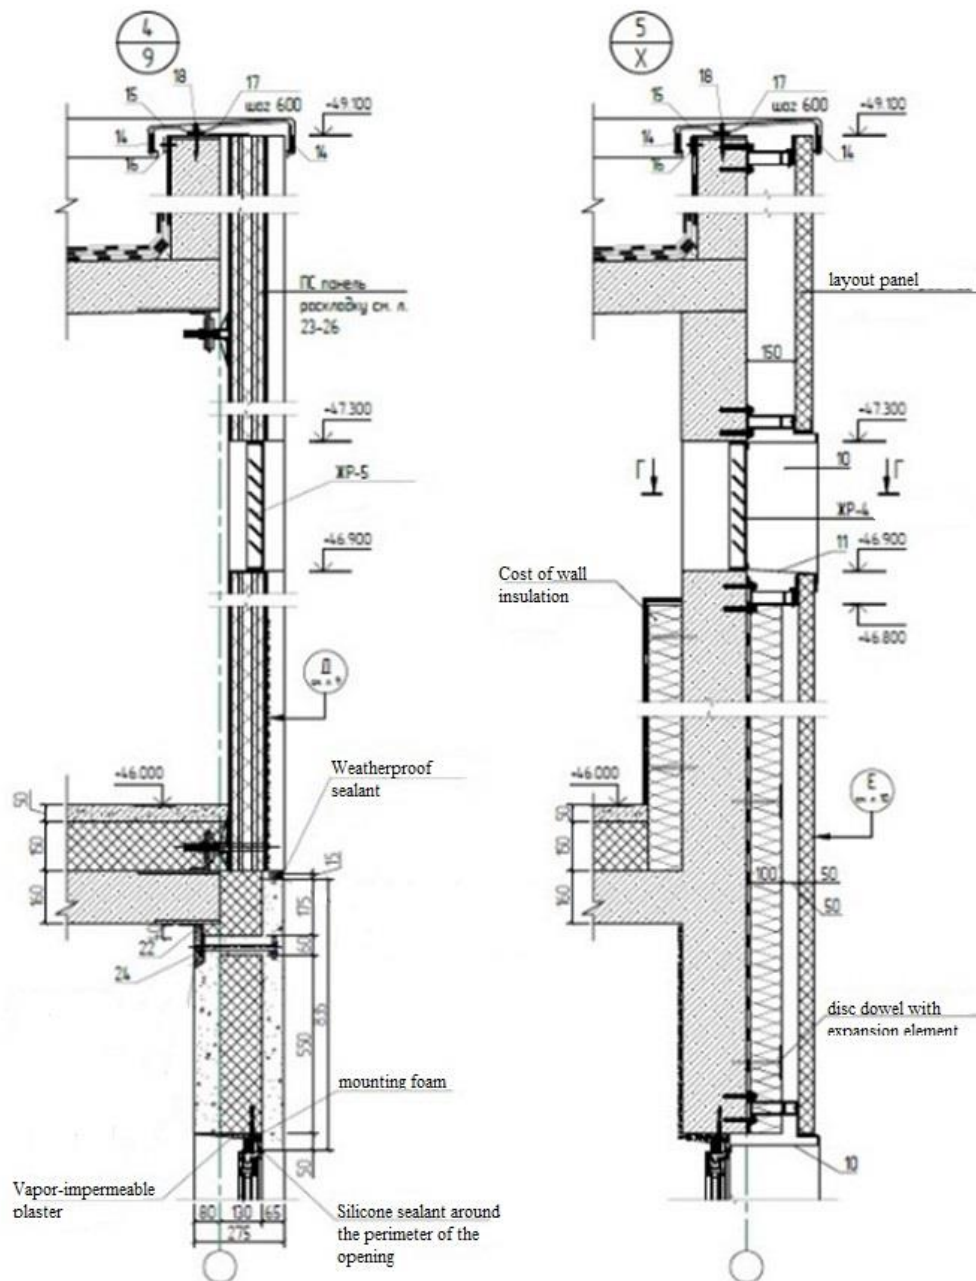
Vertical section of the external wall assembly with insulation system, indicating structural layers and potential thermal bridge locations (author's materials)
